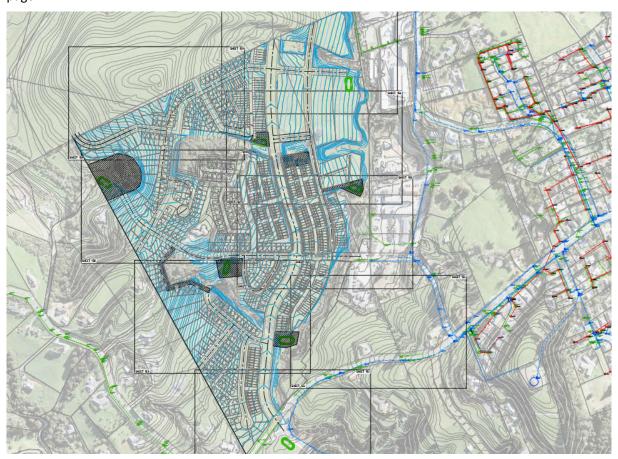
Stubbs Farm - Preliminary Civil Engineering Design, Proposed Site Plan Overview
